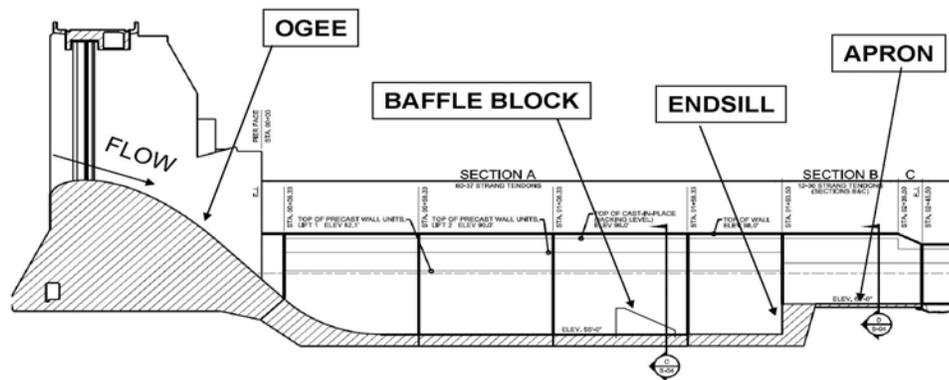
The Dalles Dam Spillway with Bay 8-9 Spillwall in elevation.
